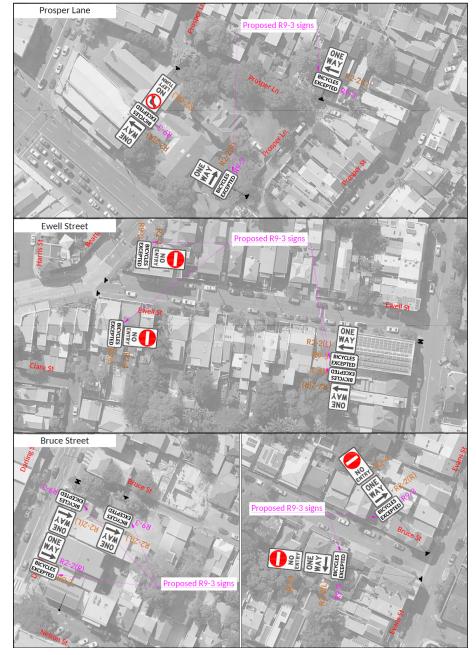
Prosper Lane, Ewell Street and Bruce Street proposal.
